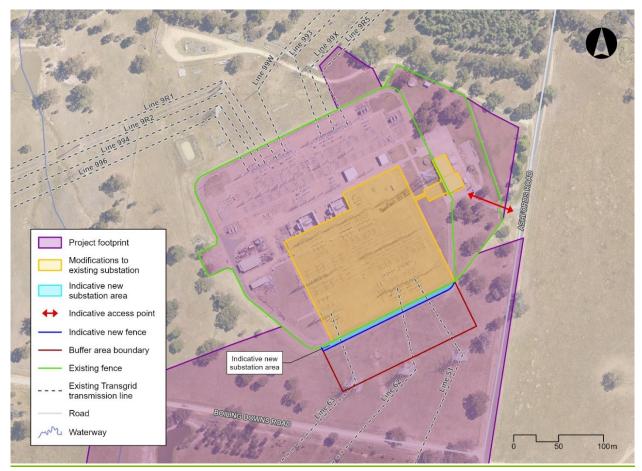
Indicative layout of modified Wagga 330 kV substation showing location of the existing access from Ashfords Road
